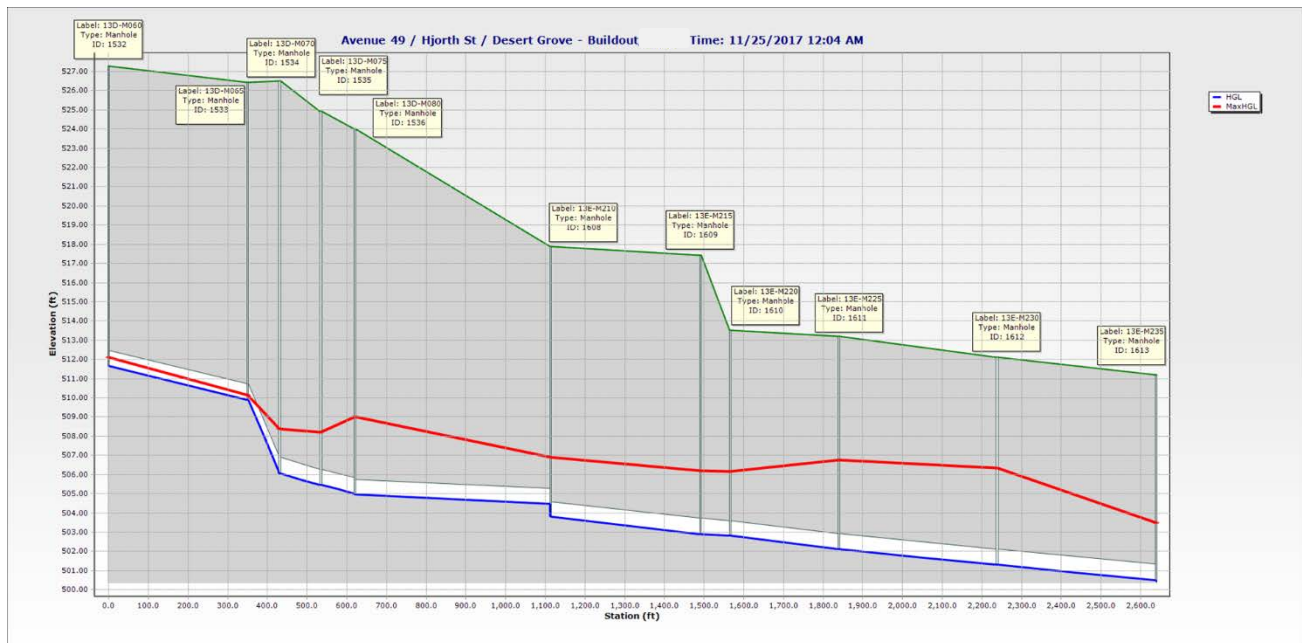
Avenue 49 between Hjorth St and Desert Grove Dr under Build-Out Conditions
